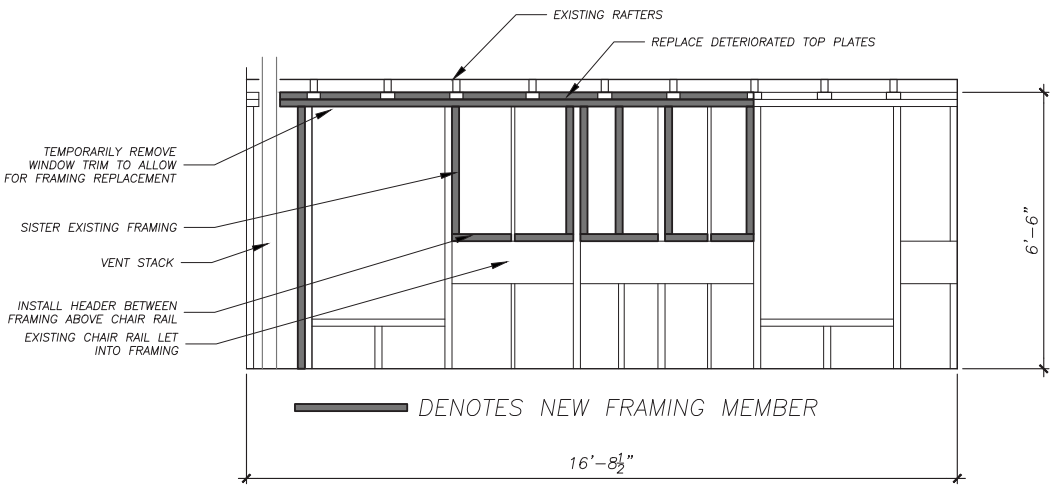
Repair of Wood Framing on south wall; see PMIS #196219 Drawings
